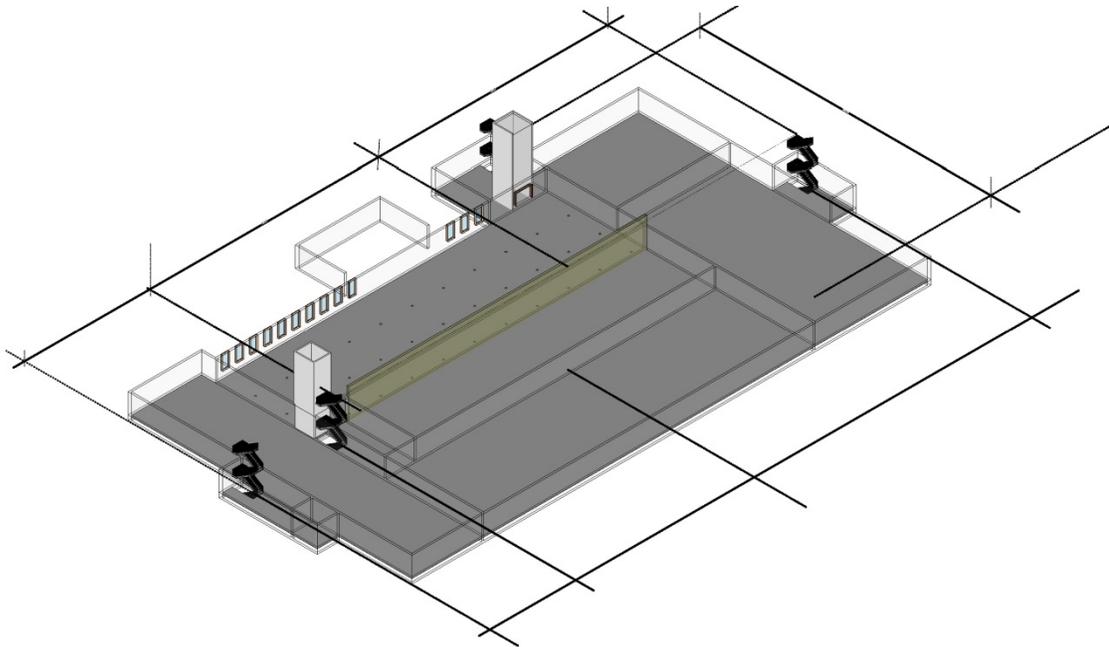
Typical Floor Plate and Existing Stairwells. Note: Image Created by Luke Beck
